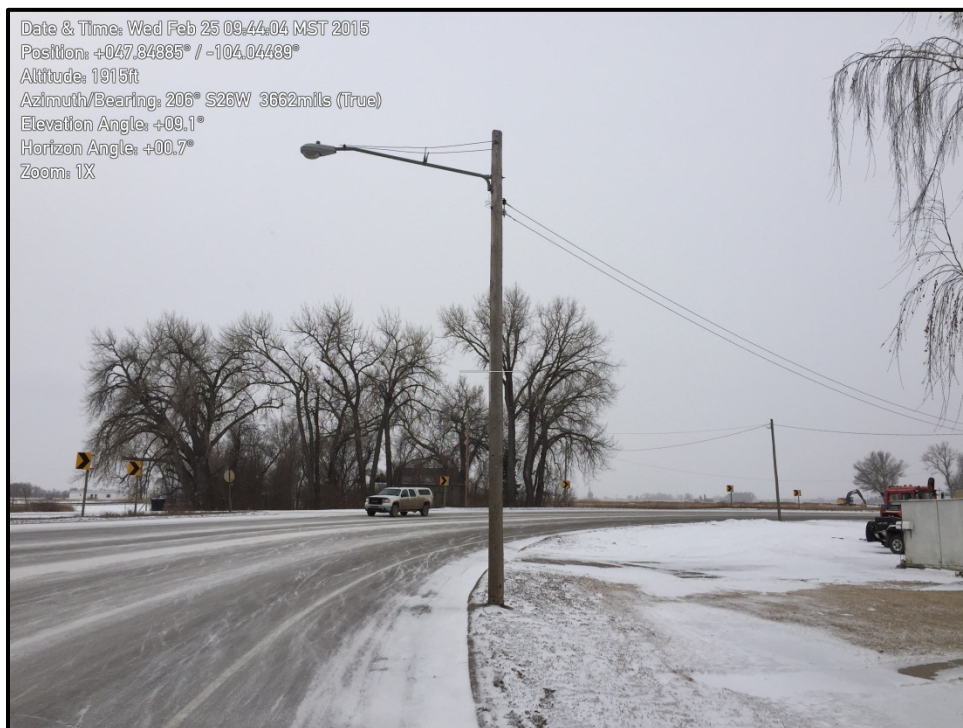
Looking south on MT 200 at drainage provided through a curb cut. RP 63.2.
